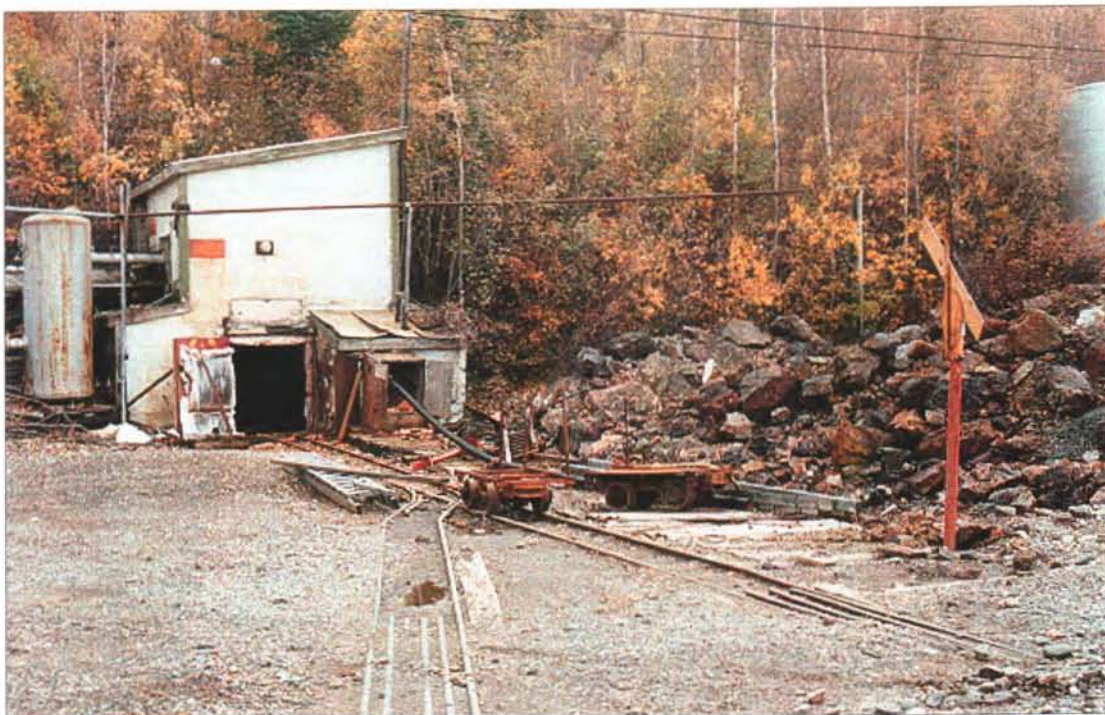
Elsa Mine. Elsa 400 Level Portal. Looking southeast. Low grade open pit ore pile to the right of the tracks.
